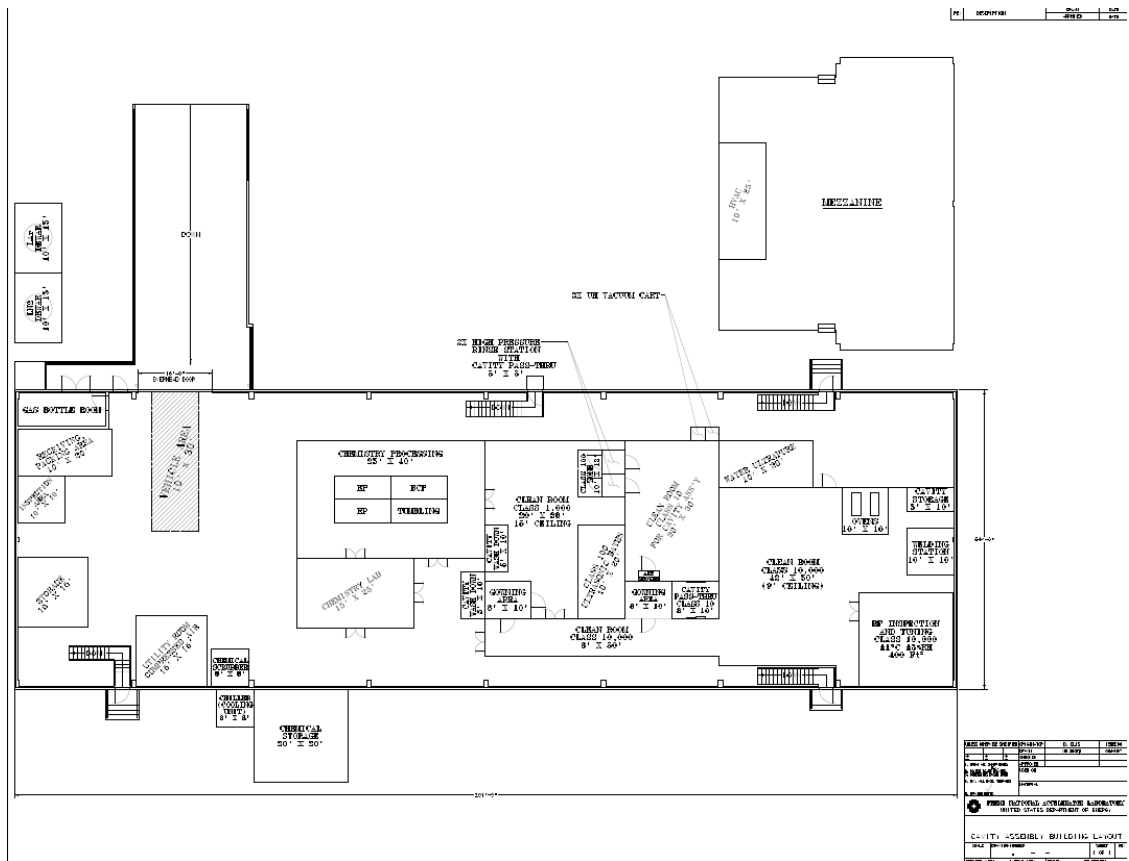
Schematic Layout of the Cavity Processing Facility
